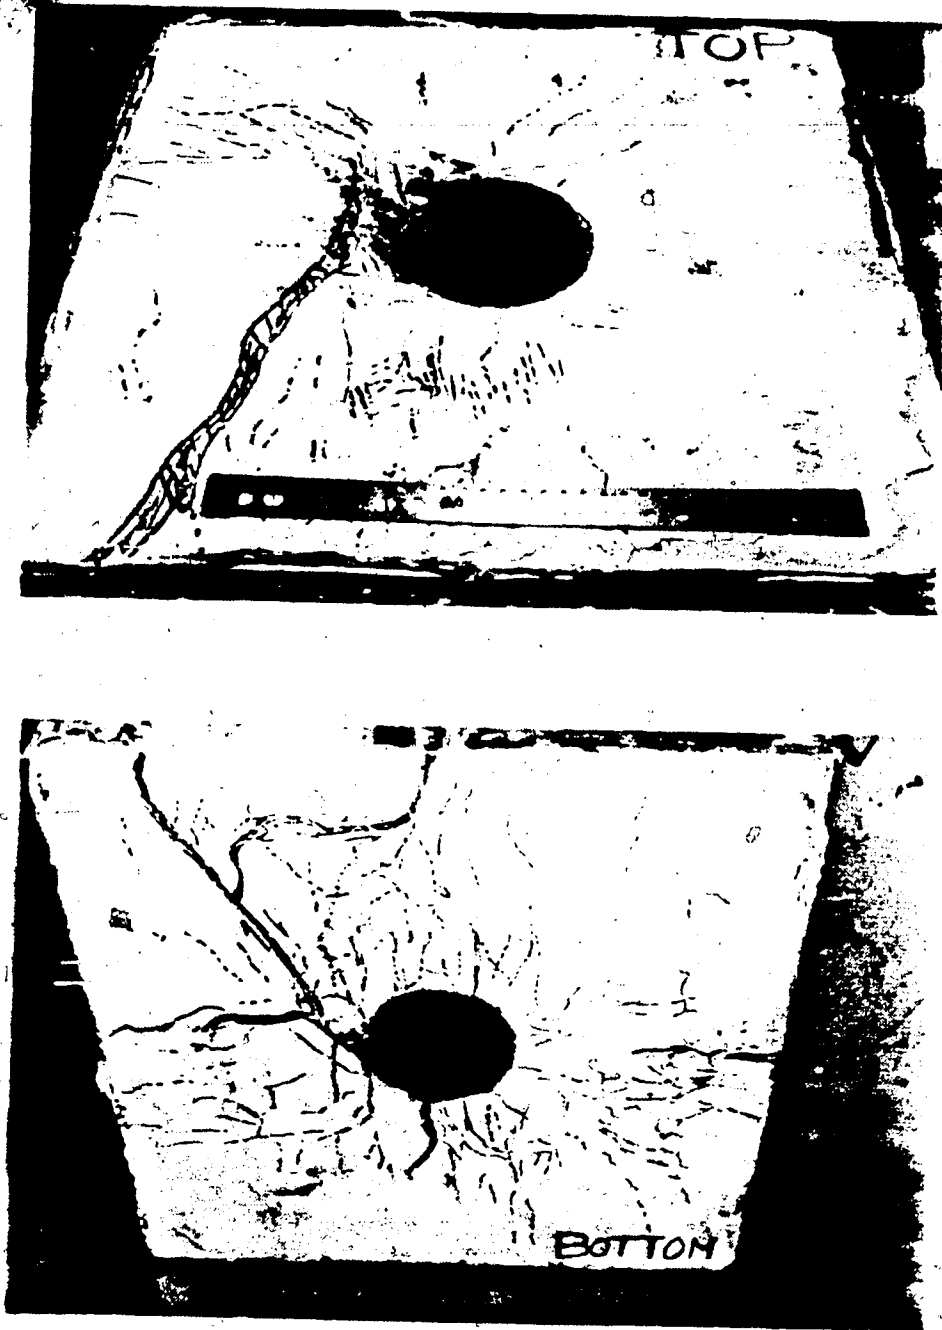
Top And Bottom View Of Test Specimen After Testing
